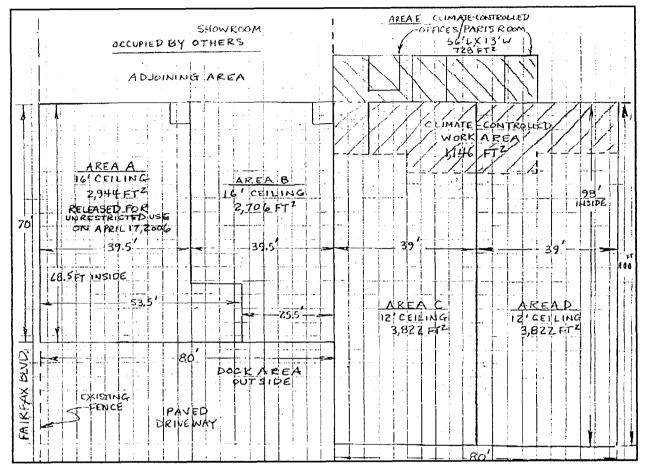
Plan of 416 N. Fairfax Blvd. facility
